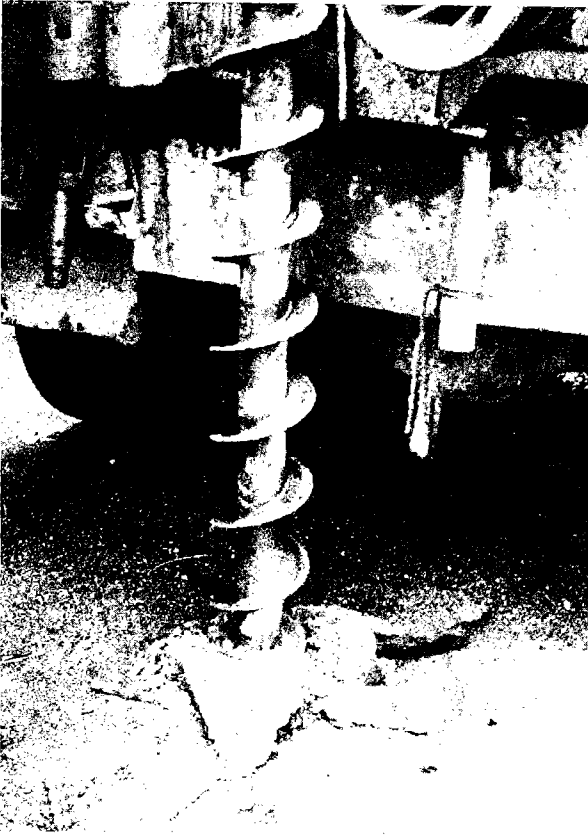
Beginning a new borehole with hollowstem auger, note condition of pavement.
